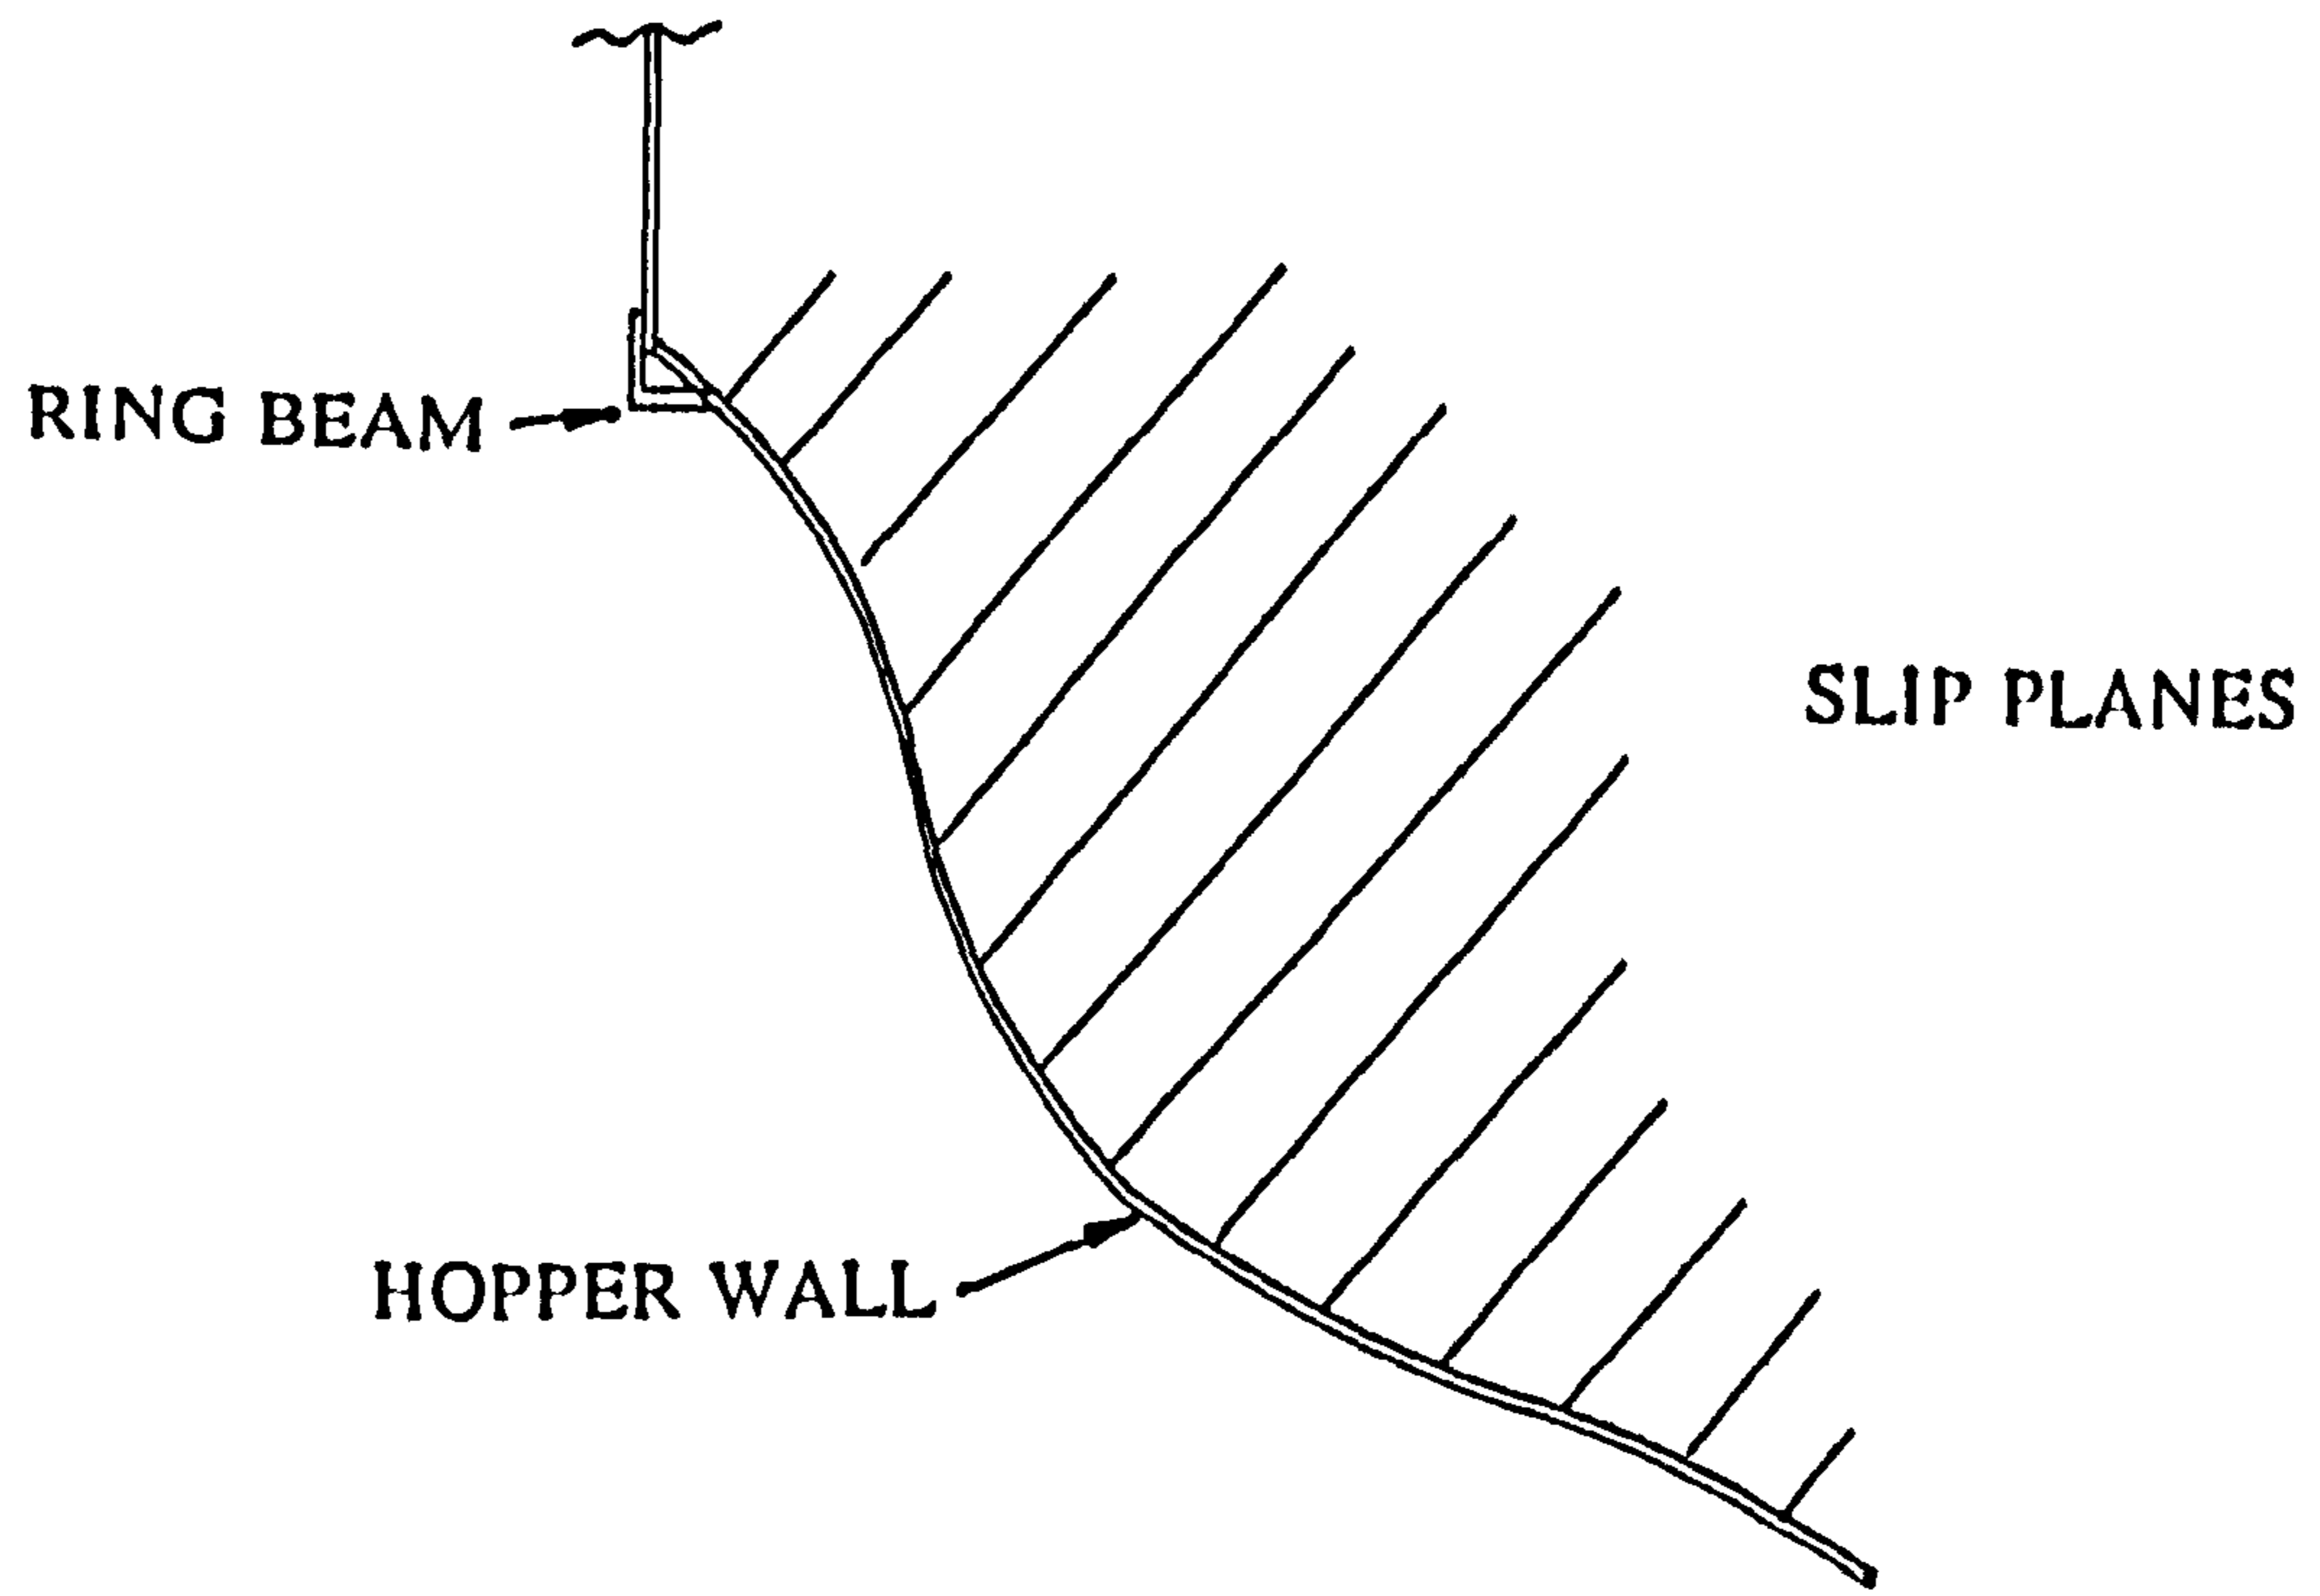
SLIP PLANES BEHIND THE DEFORMED HOPPER WALL
